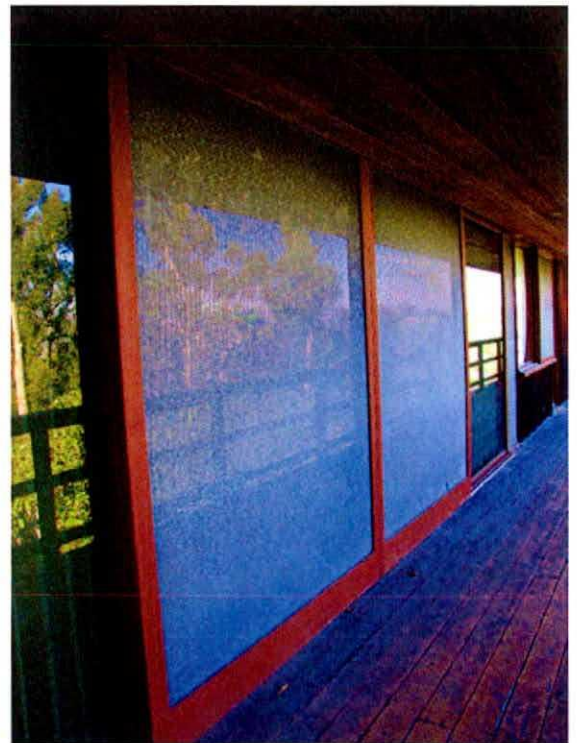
Typical sliding glass walls and fixed window walls along the north facade.
